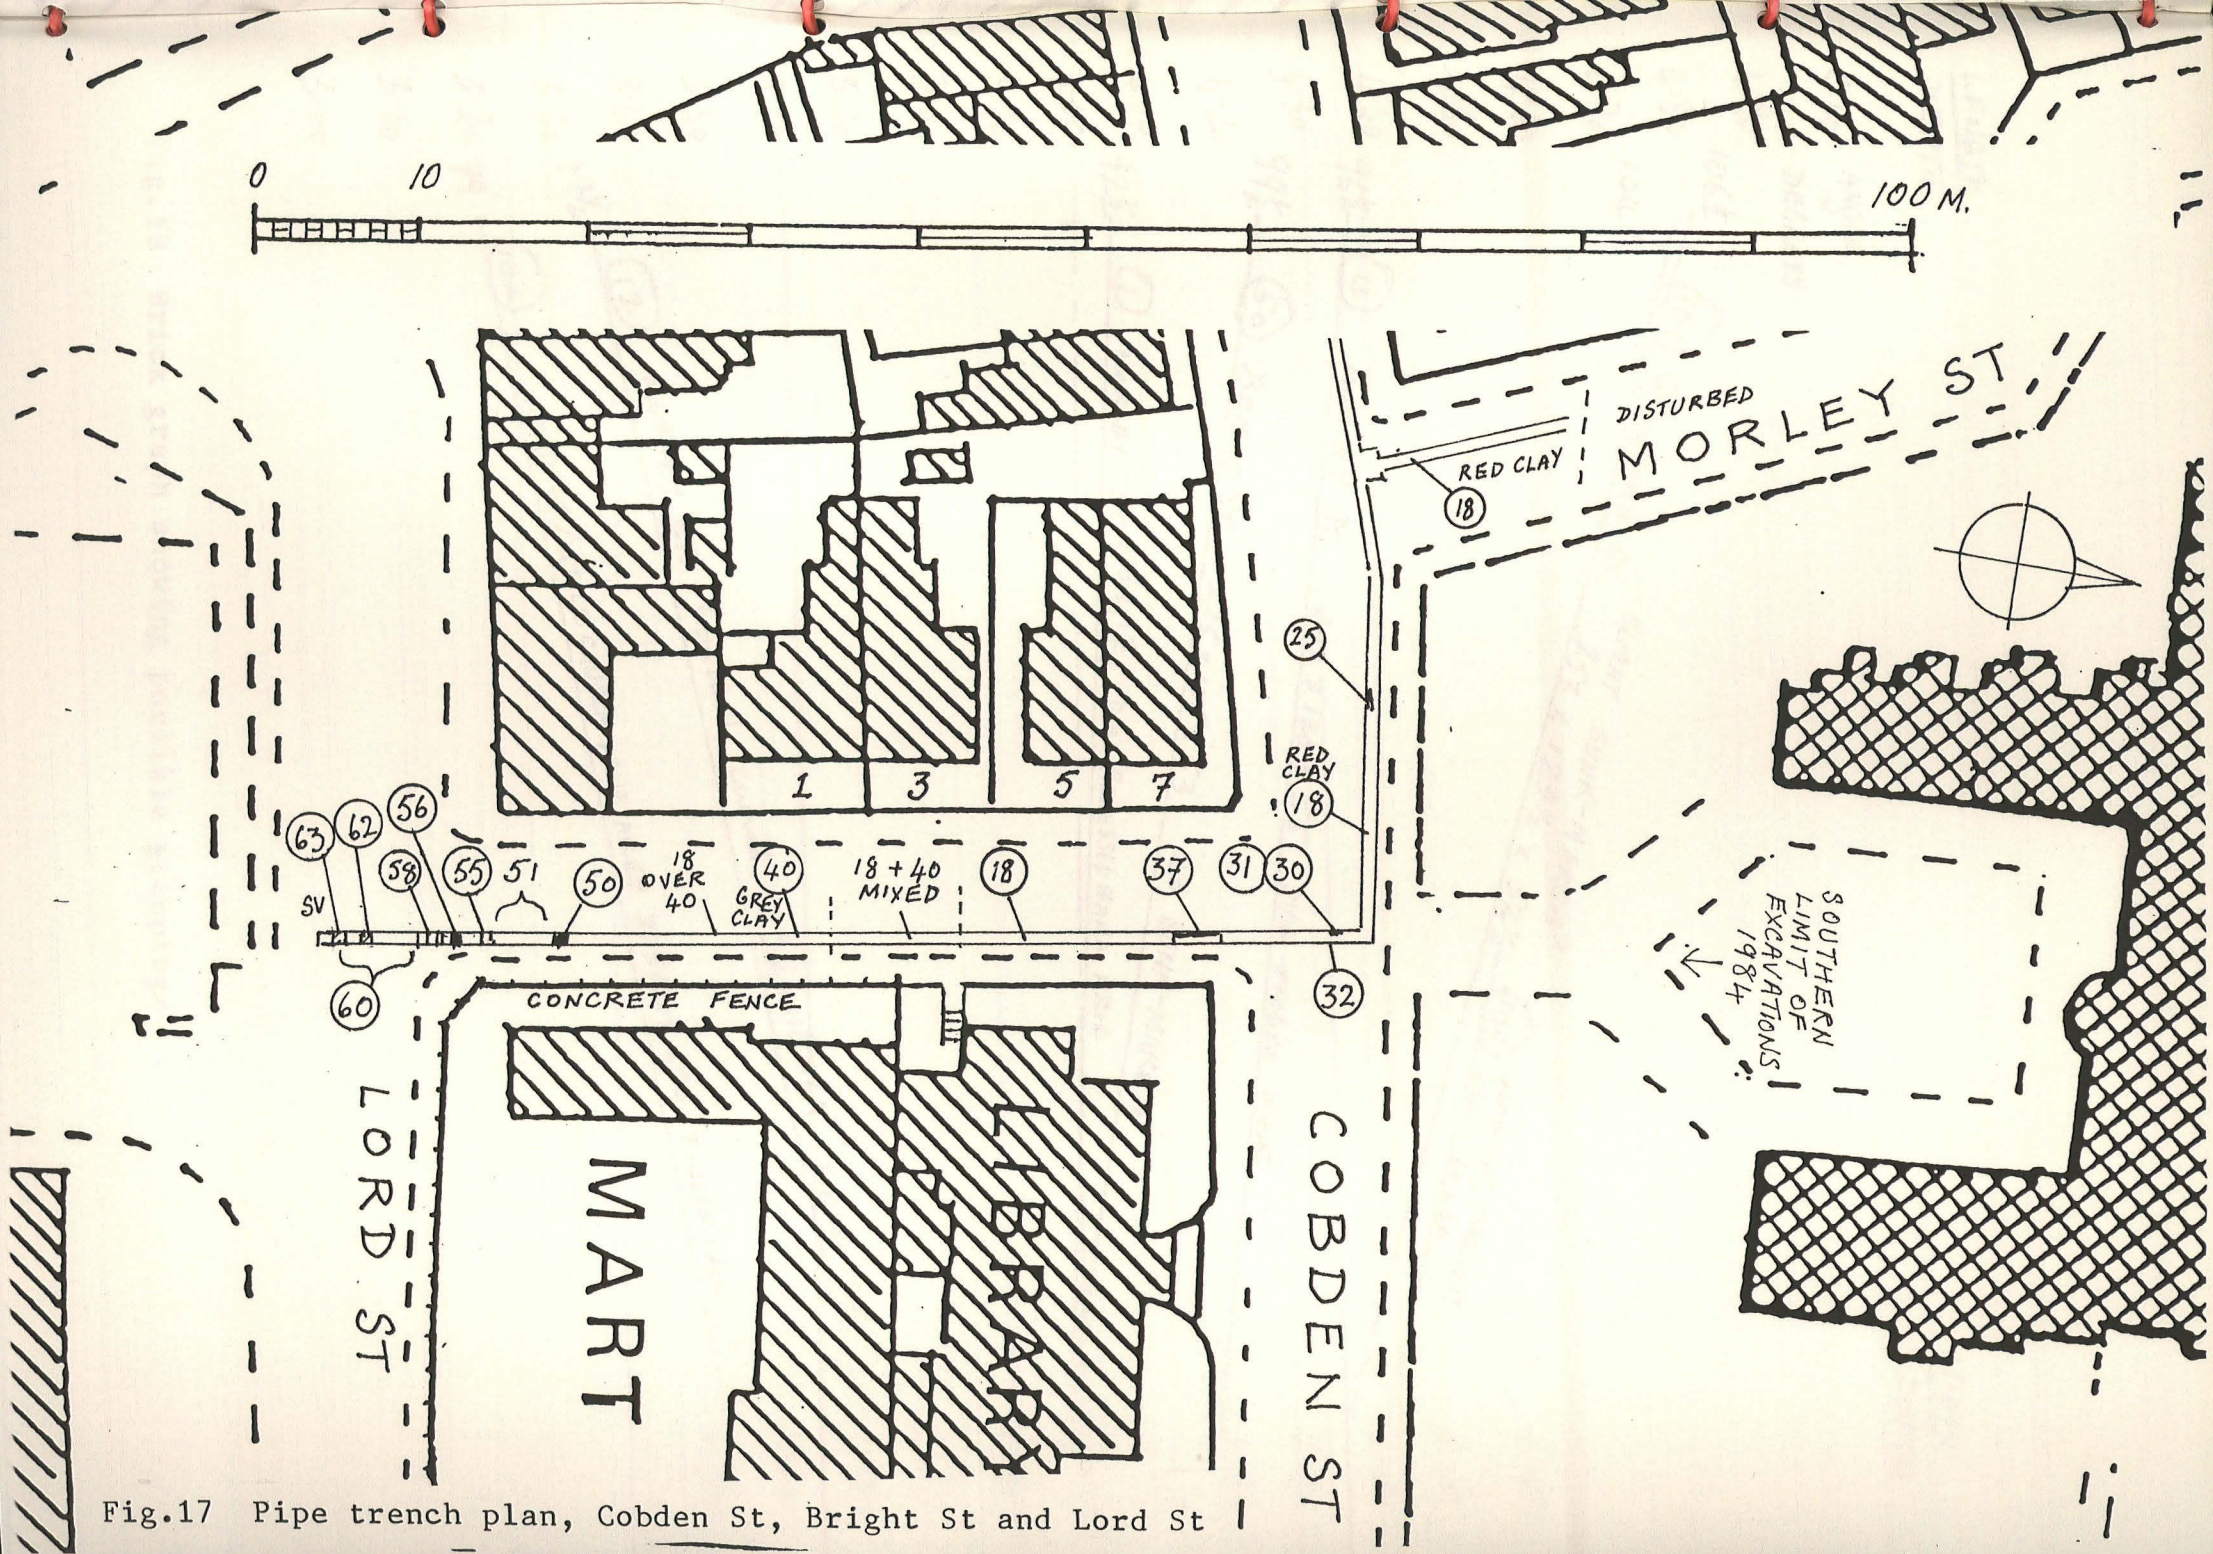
Pipe trench plan, Cobden St, Bright St and Lord St
